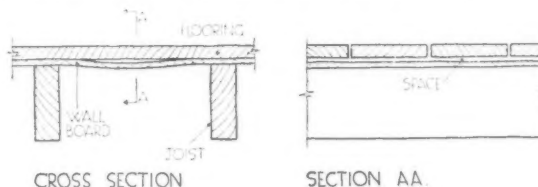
Sections of a cheap floor construction which, owing to the inevitable sagging of the wallboard ceiling, provides cavities that harbour bed-bugs.
